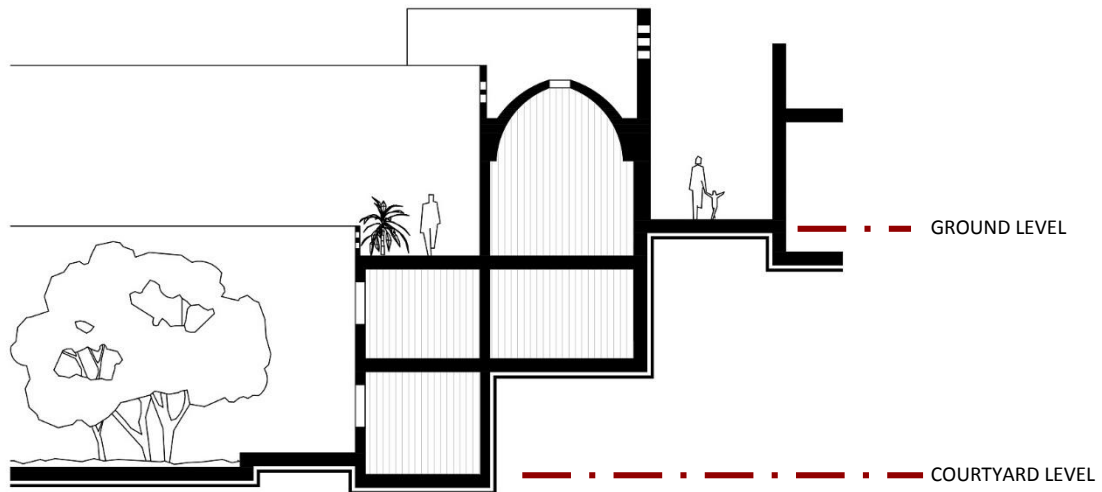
, schematic section, the lower floor of the central courtyard compared to the passageway floor level in sunken houses creates a house surrounded by the earth, where the temperature is constant at a level of -5.00 meters in desert area, drawing by author
